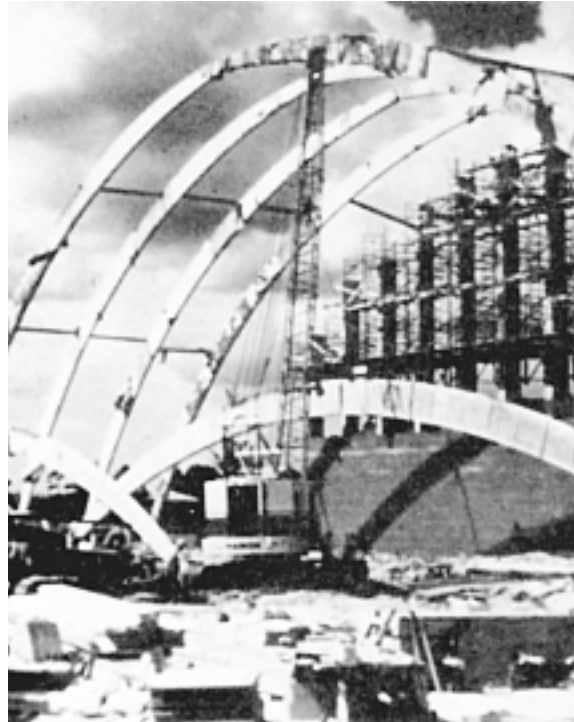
Glued laminated timber beam. (Courtesy of American Institute of Timber Construction)
